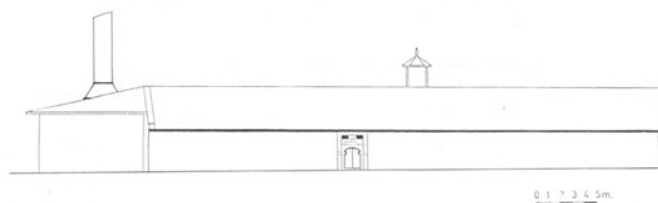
Northern Wall (Altinsapan, 1999: Drawing 2)
